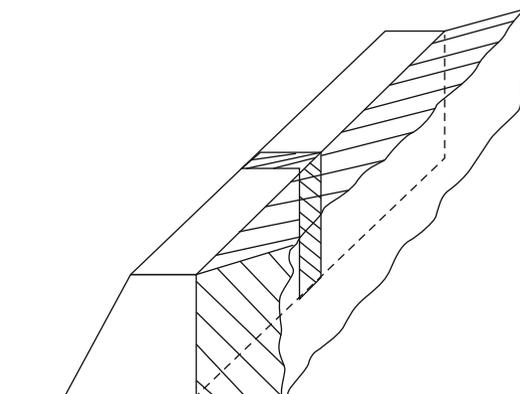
Retaining wall showing a plate slice as an example of plane strain conditions
